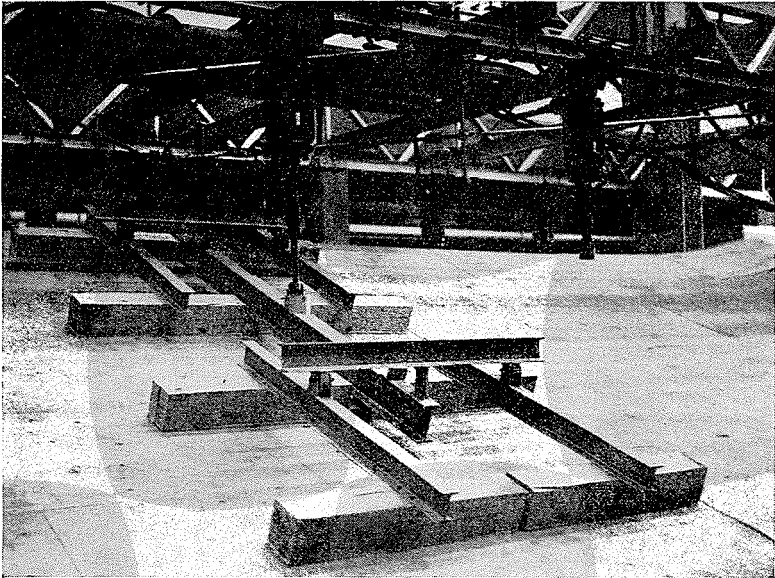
Hydraulic Jack Loading Divided into Four Equal Line Loads by Whiffletrees.
